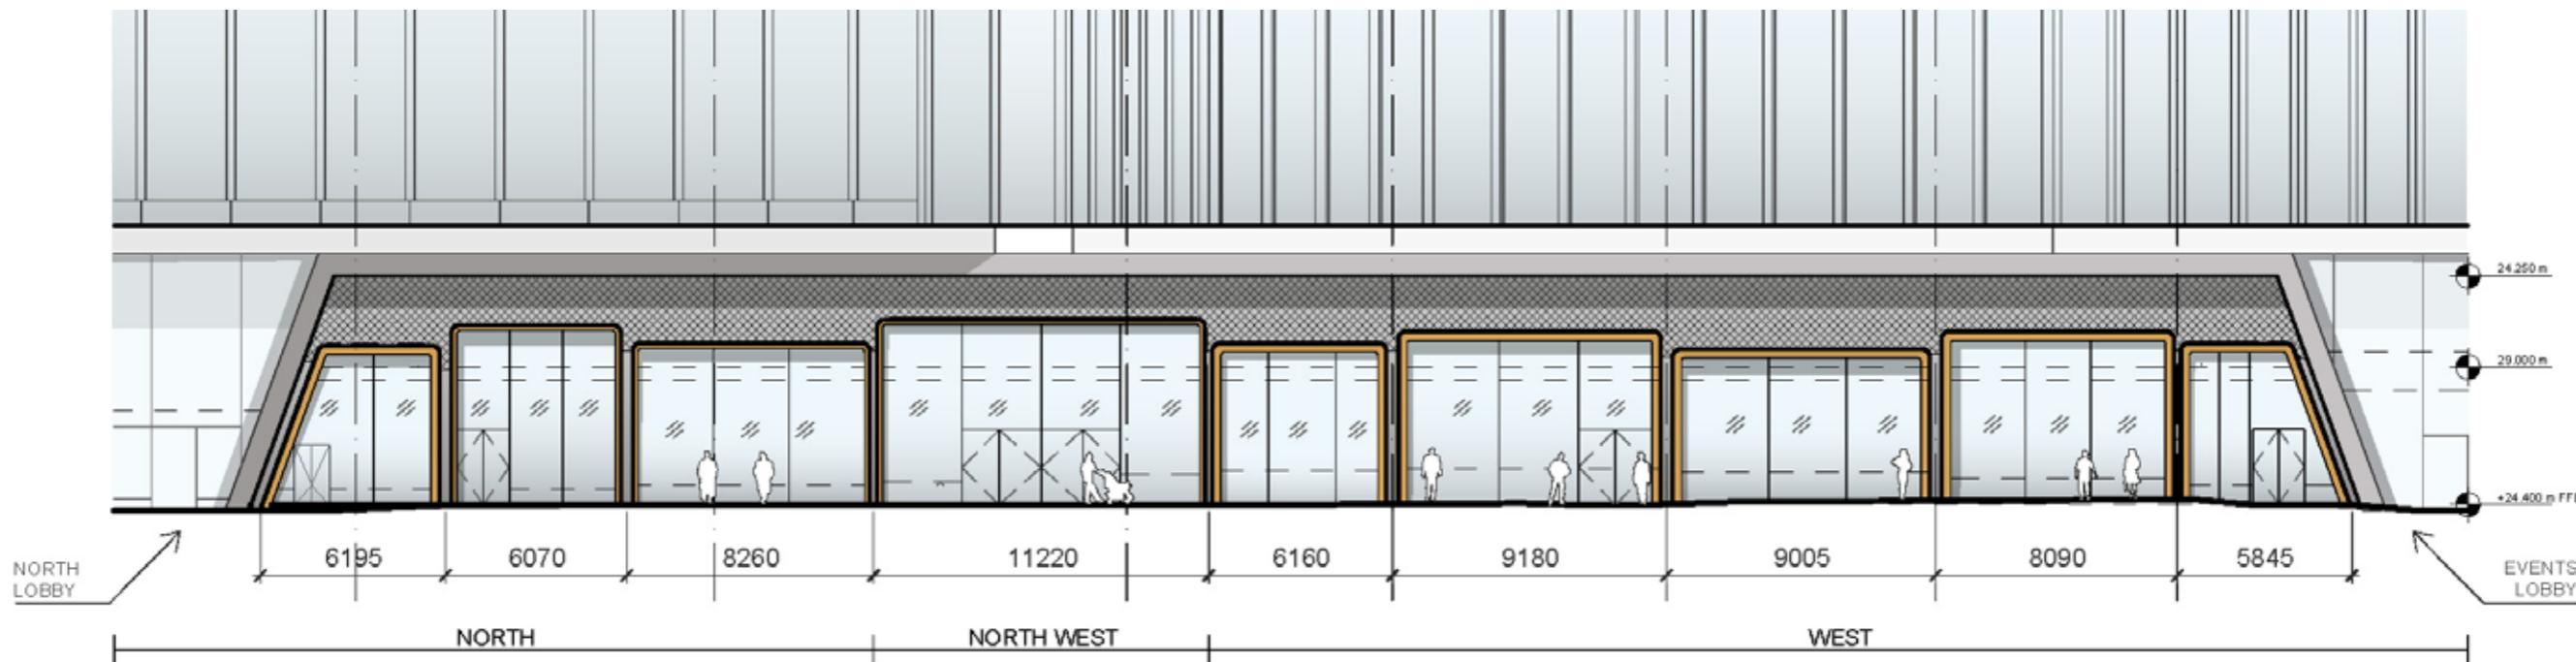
Long elevation of the North Anchor Unit on north and west facade
